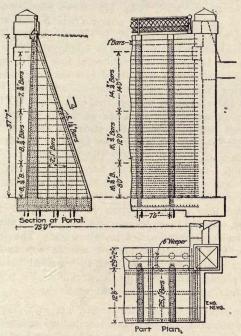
Retaining Wall, Great Northern Ry., Seattle, Wash.
